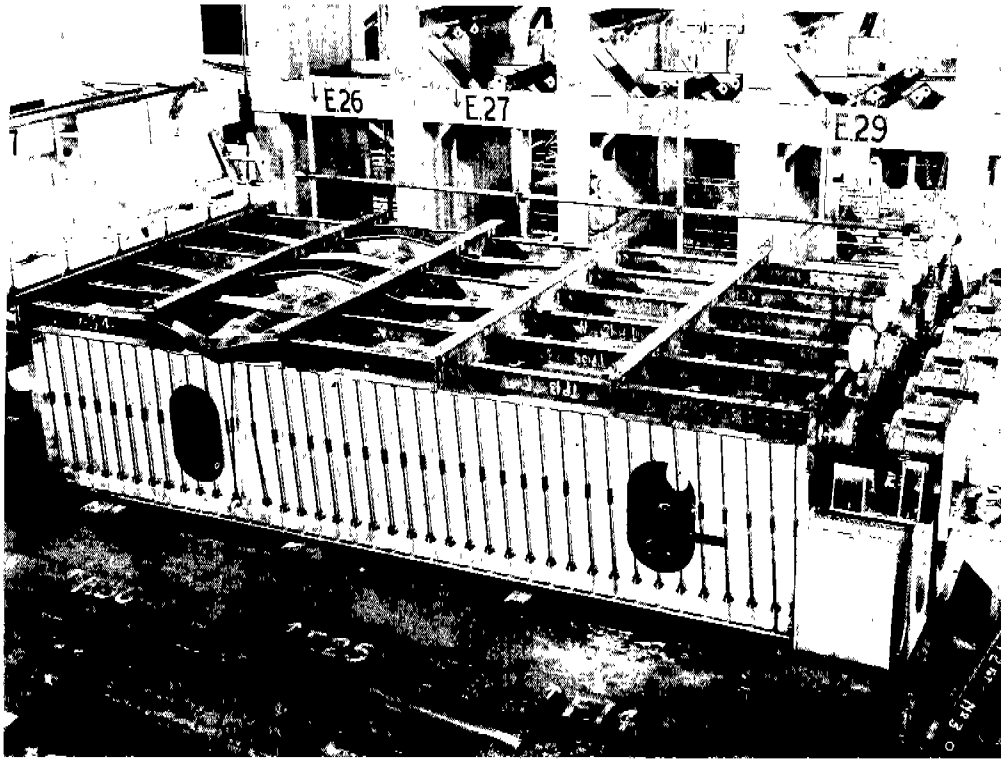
FIRST GRILLAGE AFTER COLLAPSE UNDER AXIAL LOAD.
